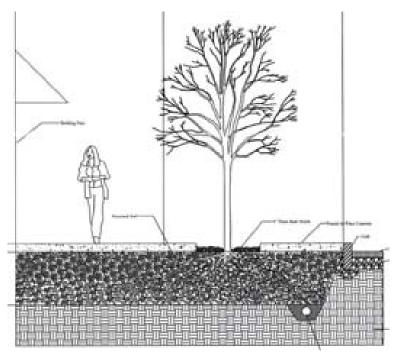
Structural soils provide void space for root growth and load-bearing for sidewalk
